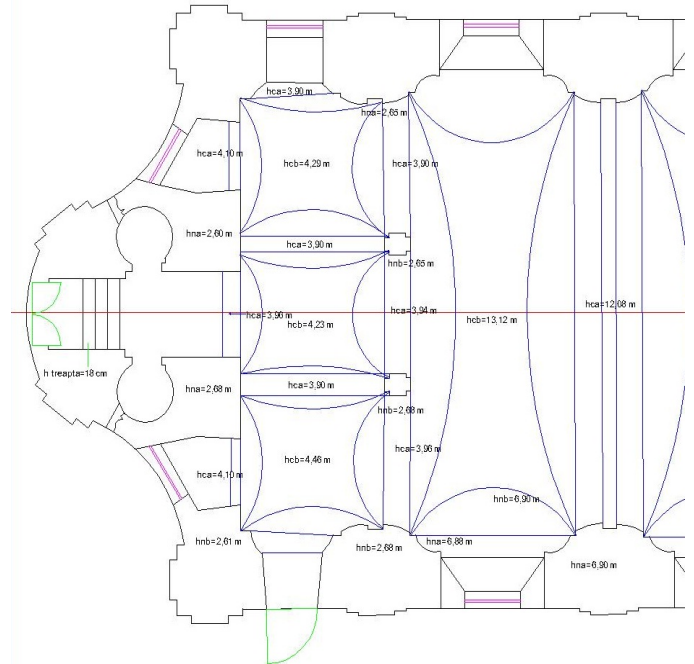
Blueprint. Masonry structure. Main nave, first vault segment.
